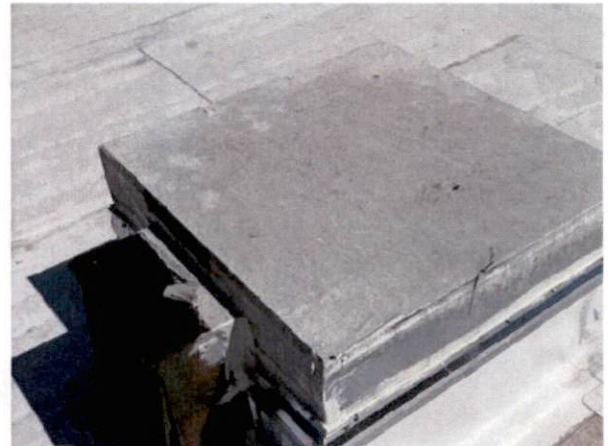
View of HA 3, non-asbestos containing gray wrap on roof-mounted HVAC unit.
